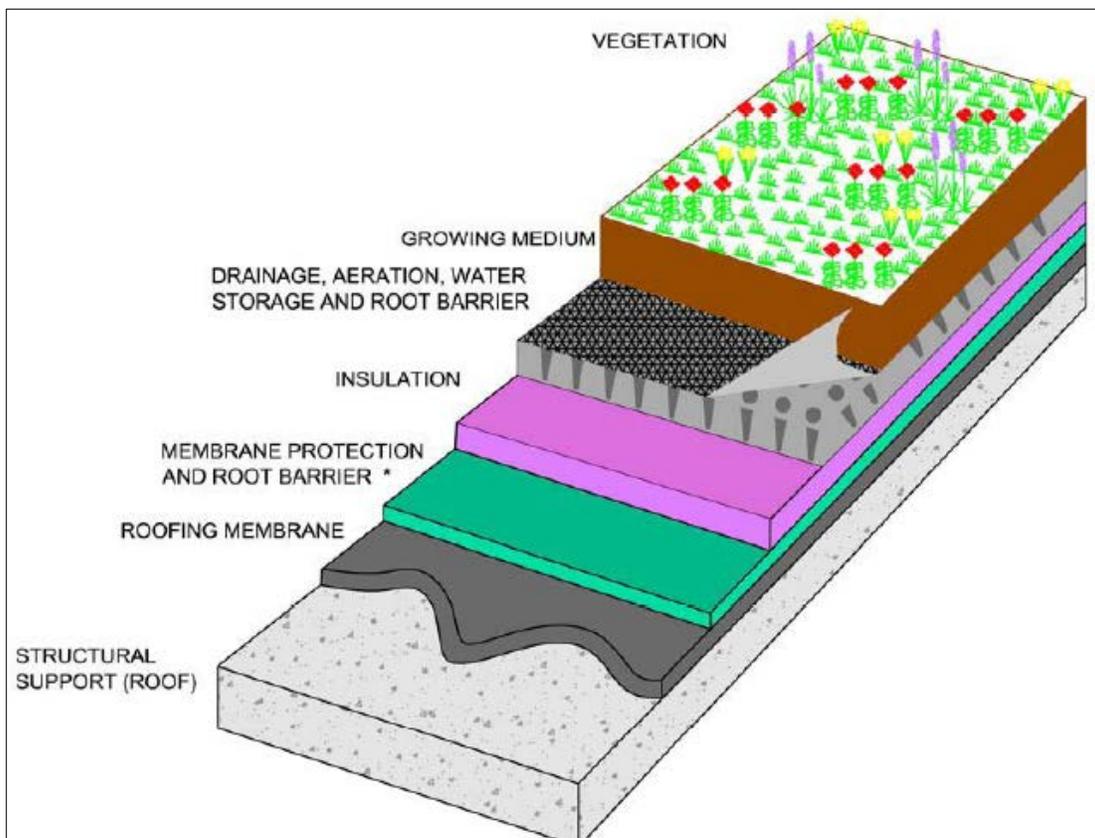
Typical green roof cross section (MDE 2000, 5.44).
